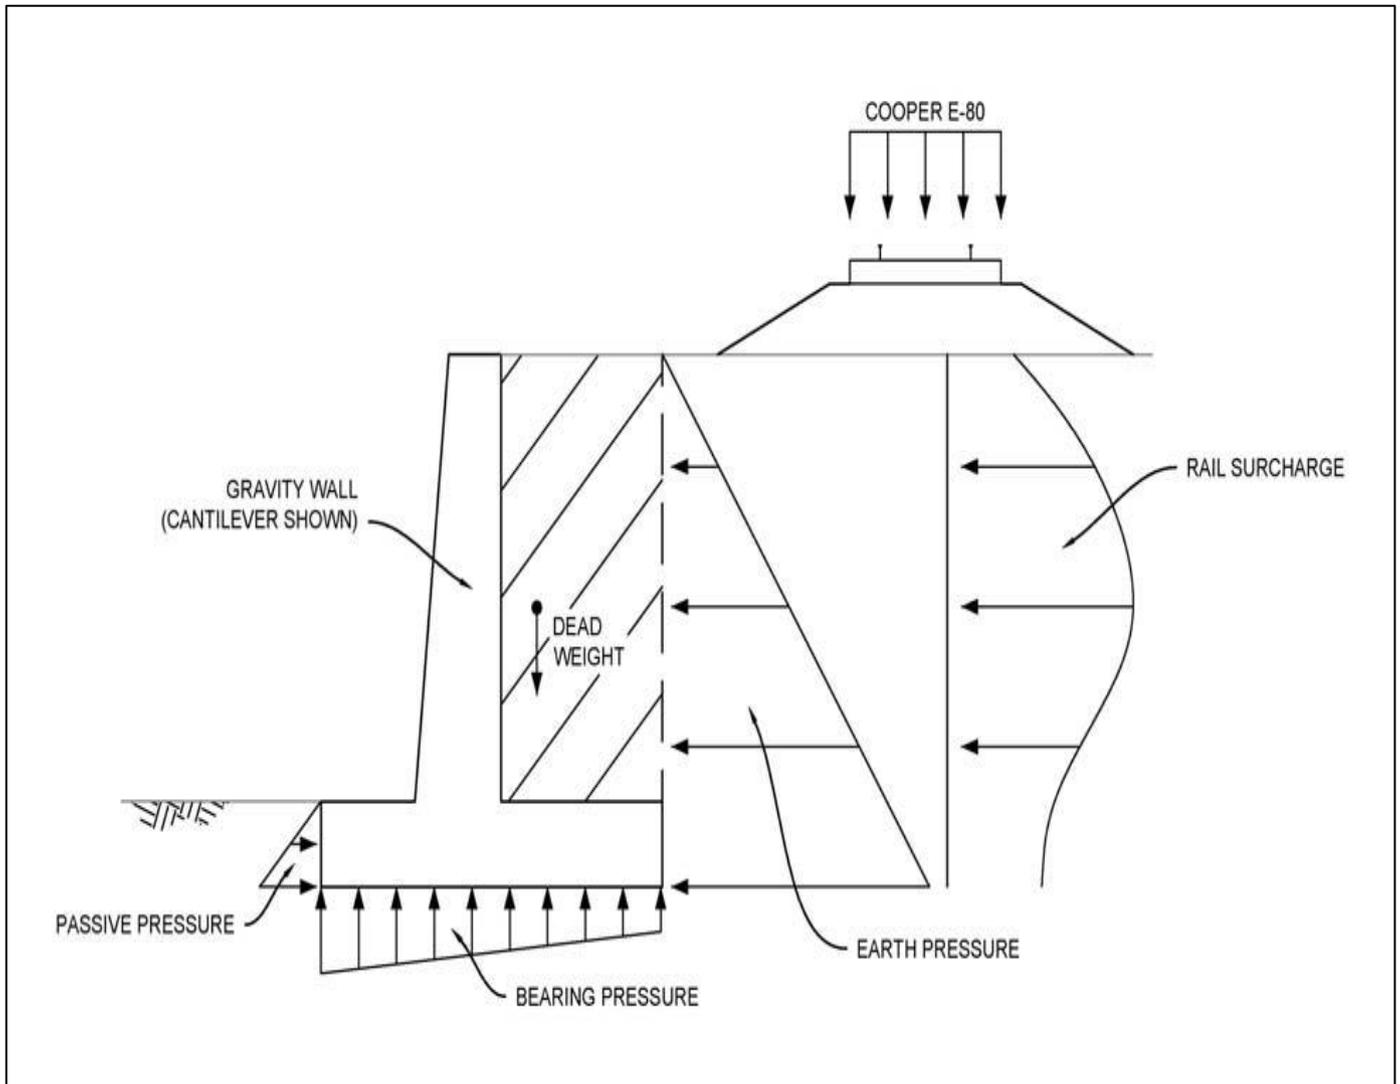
Gravity Retaining Wall Schematic Bryan Duevel et al (2014)
